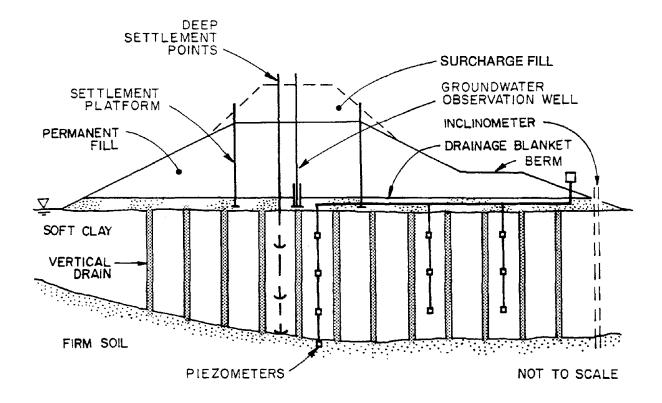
A typical well-instrumented vertical drain installation for a highway embankment (Rixner, et al., 1986)
